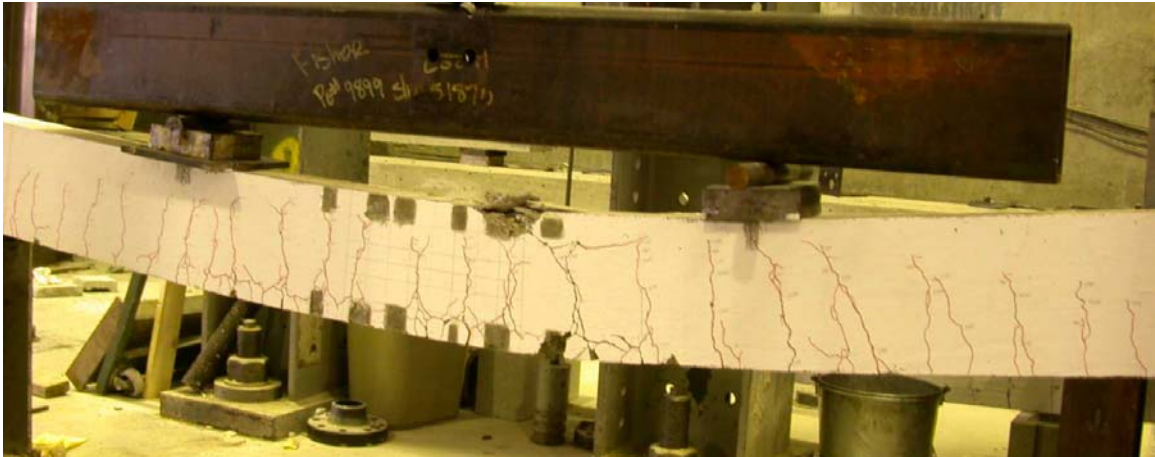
Cracking Pattern of 10-mm Diameter Large-Scale Model DHFRP R/C Beam P-2.
